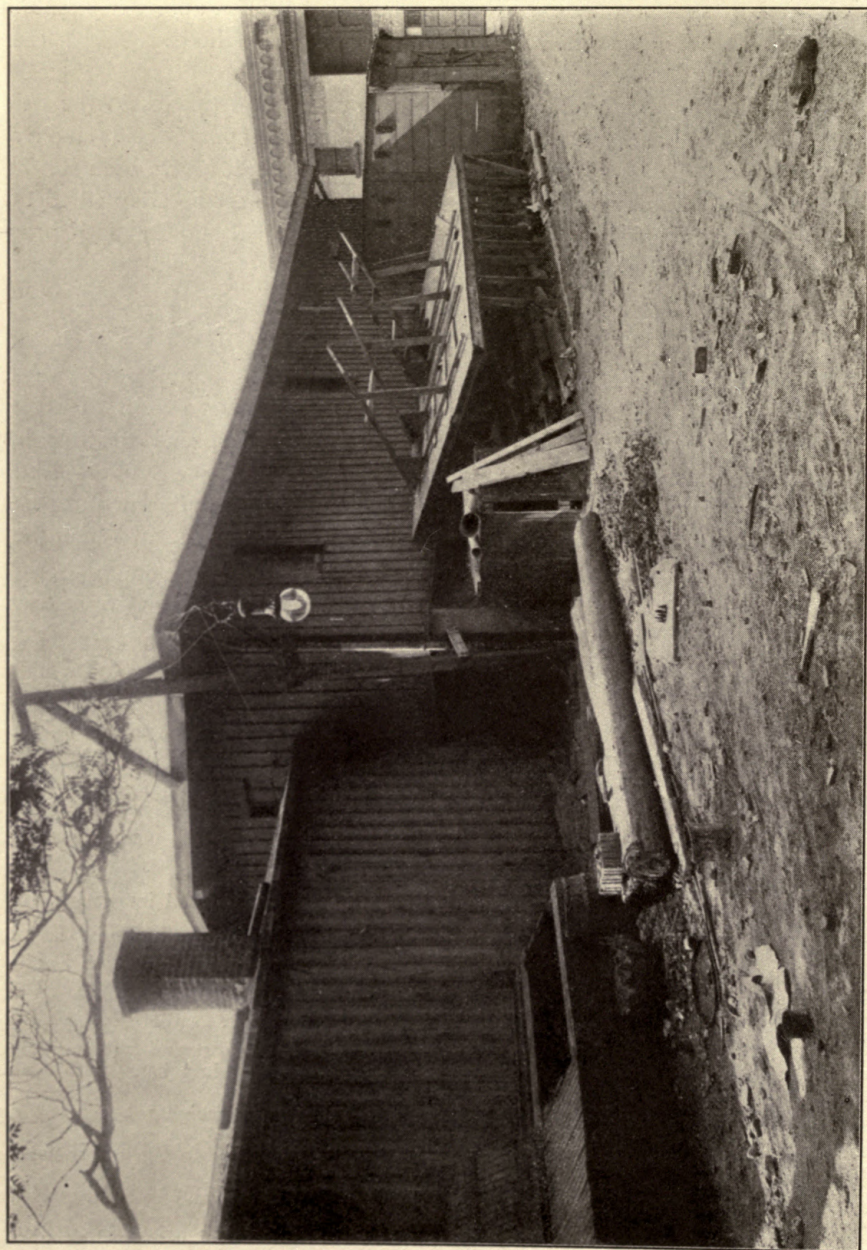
OLD STOREHOUSE—24TH STREET YARD.
